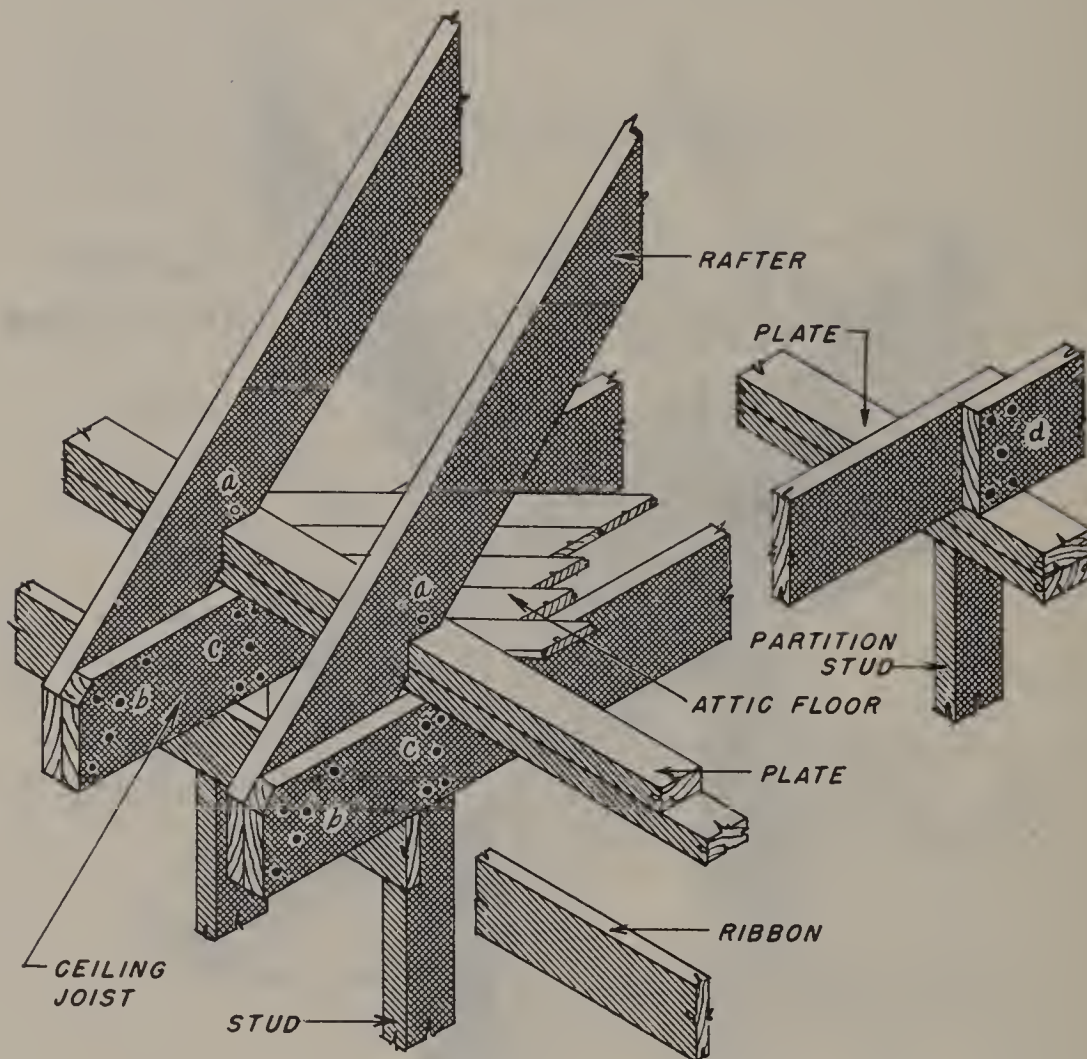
Rafter nailing. This is a suggested framing that provides superior resistance to the forces to which rafters are subjected and, with the addition of the rafter tie or collar beam shown in figure 26, affords a very secure arrangement. The weight of the roof is carried by the plate with the rafter placed directly above the stud. *a*, Rafter toenailed to plate with one tenpenny nail. Five tenpenny nails join, *b*, rafter and joist, *c*, joist and stud, and, *d*, overlap of joists. Note: Thrust is resisted by the connection of rafter to joist, and the nailing of the joist to the stud gives resistance to uplift. Ribbon may be let into either the outer or the inner edge of stud.
